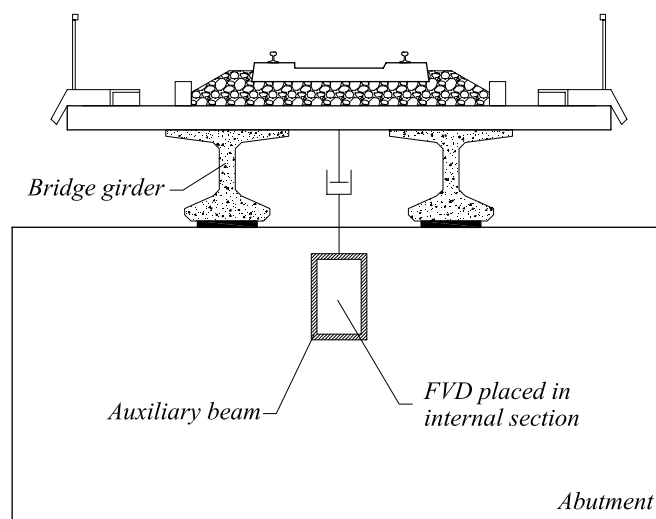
Retrofit configuration for a concrete girders bridge deck.
